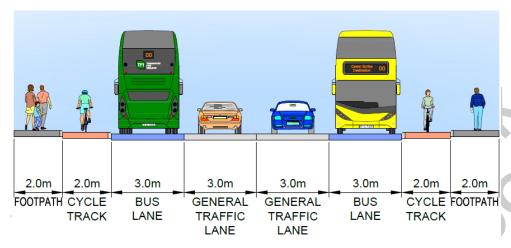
Section 1, Proposed Option 5 - Cross Section A-A
